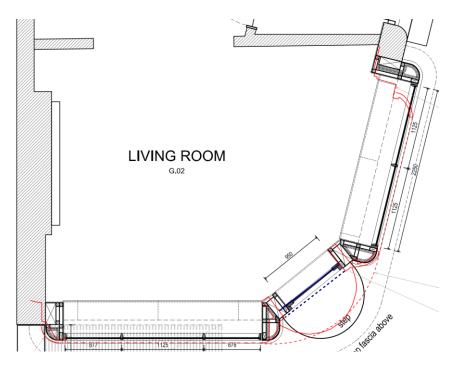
Proposed shopfront plan with previous shopfront outlined in red
